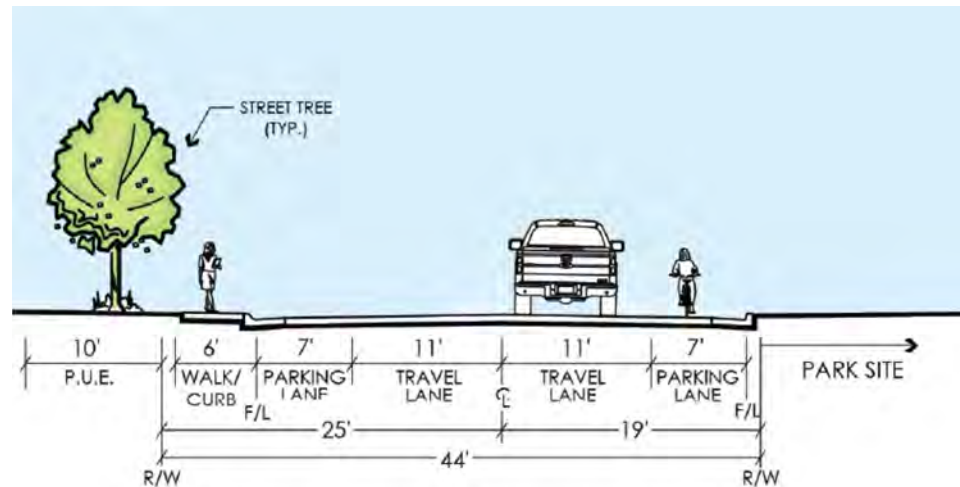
INTERIOR COLLECTOR ROAD (PARK FRONTAGE)
